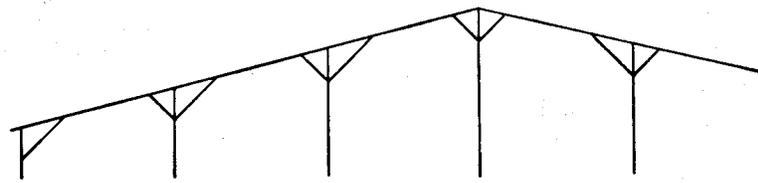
, 11 and 12 are outlines of typical transverse bracing that can be adapted to any one of the three types of frame. These systems are somewhat similar and their use will be determined by the same considerations for any of the frames selected.
